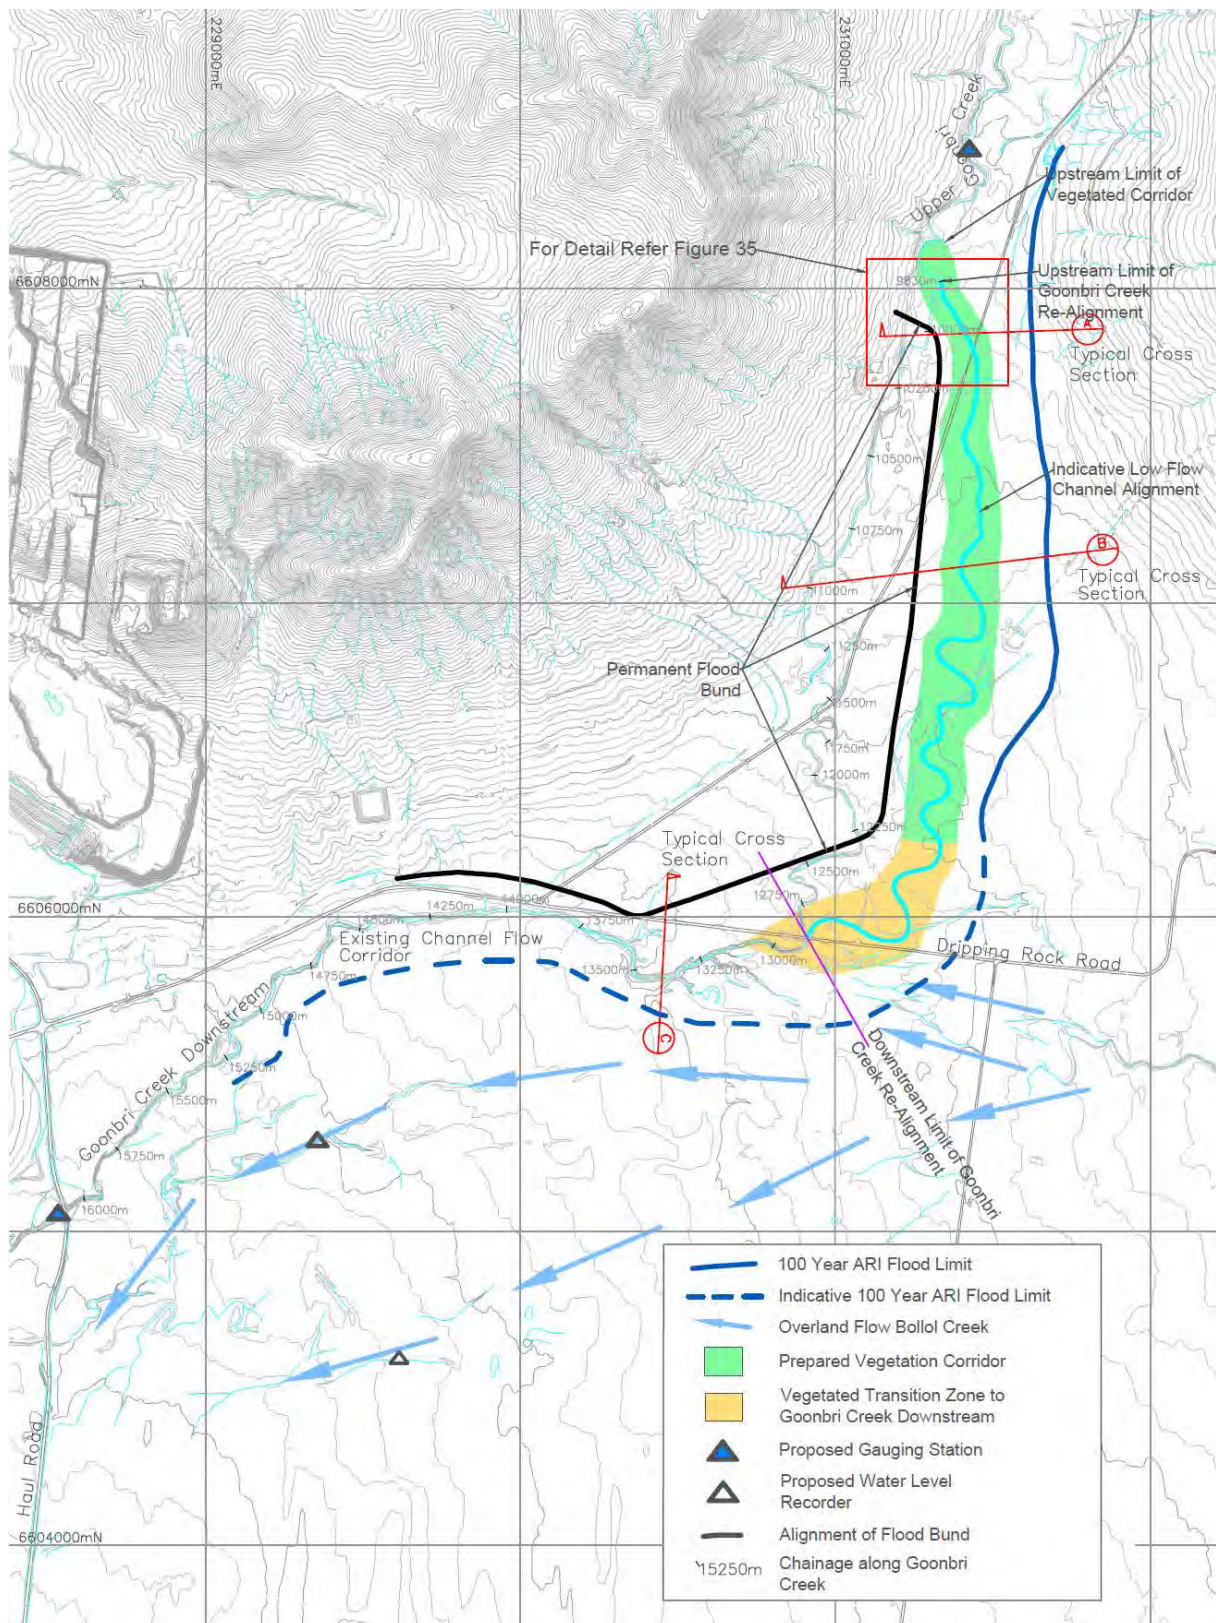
Conceptual Design Layout and Details of the Permanent Goonbri Creek Alignment
